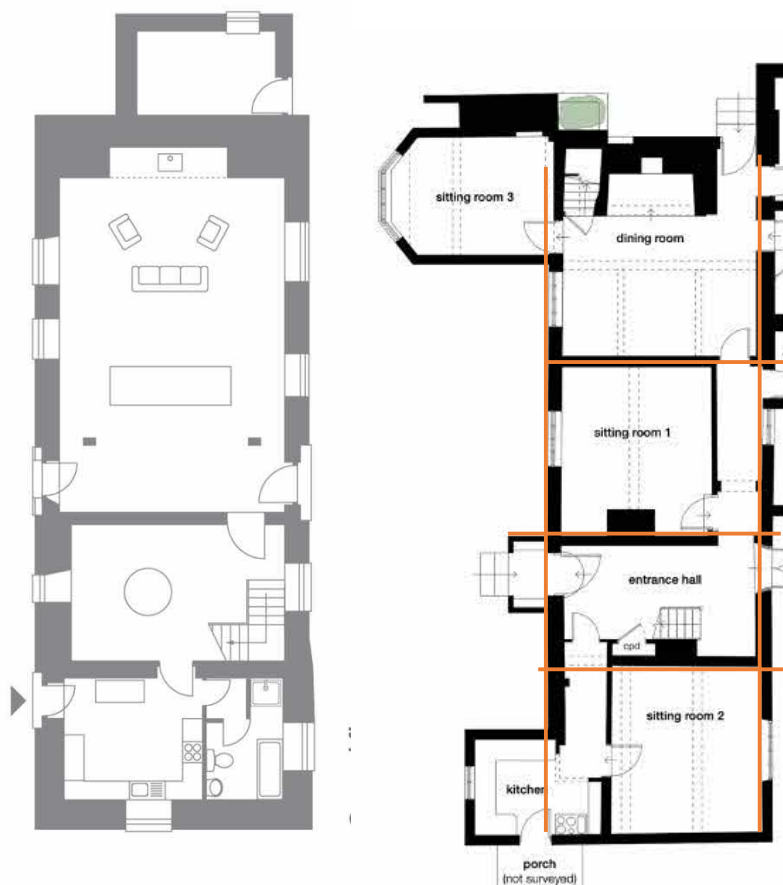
Left: The plan for of Plas Uchaf, near Corwen, Denbighshire, a hall house of c1400; and the ground floor plan of Churton Hall. These are at different scales but the outline in orange of Churton Hall shows the possible layout of the cruck framed hall. Sitting rooms 2 and 3 were added in the 17th century with a lateral chimney to the east elevation. At this time floors and the stairs would have been inserted.
